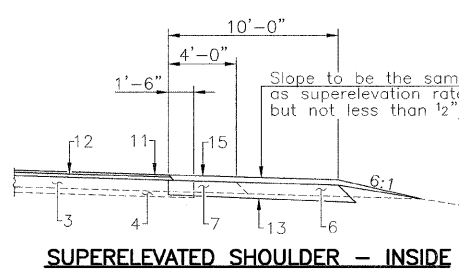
DETAILS & TYPICAL SECTIONS F.A.S. 732 (C.H. 17) (FARMERSVILLE OVERPASS) SECTION 07-00125-01-RS MONTGOMERY COUNTY
